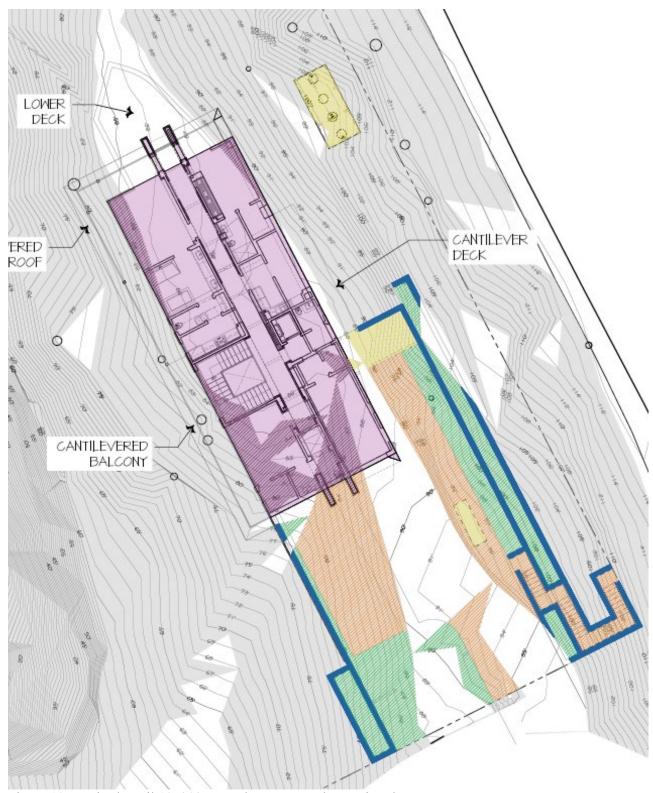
Revised April 10, 2025 Development on Slopes Site Plan.
